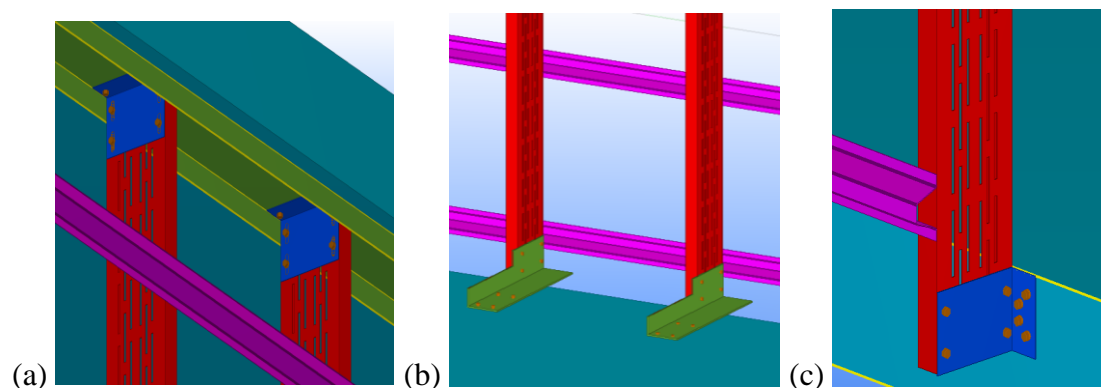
Types of connections between Cold-formed steel curtain wall and reinforced concrete slabs: angle and track (a), custom-shaped connection (b), angle (c).
